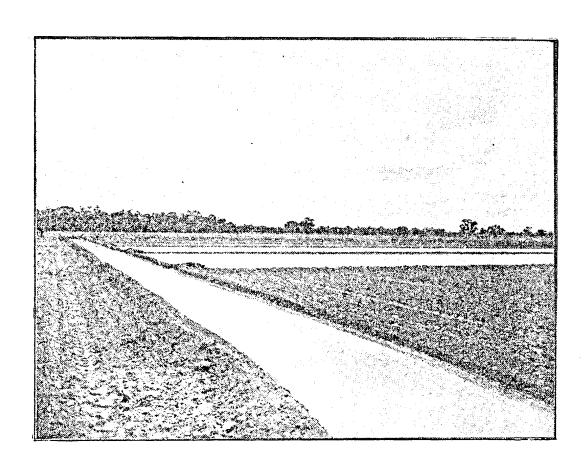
Newly laid out land being irrigated. Water carried to spur channel via fill bank channel.
